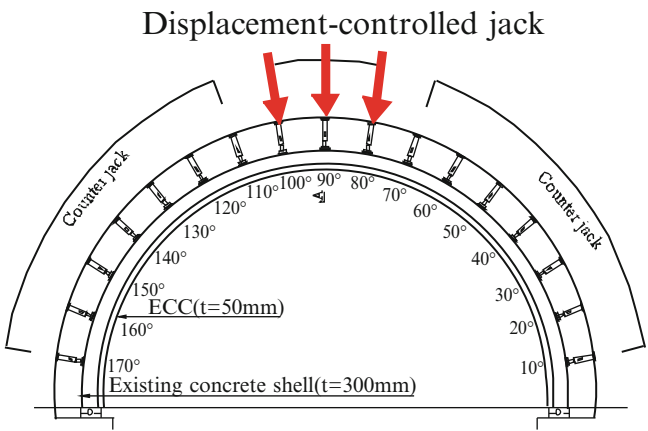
Loading test of R/ECC liner reinforcing construction
